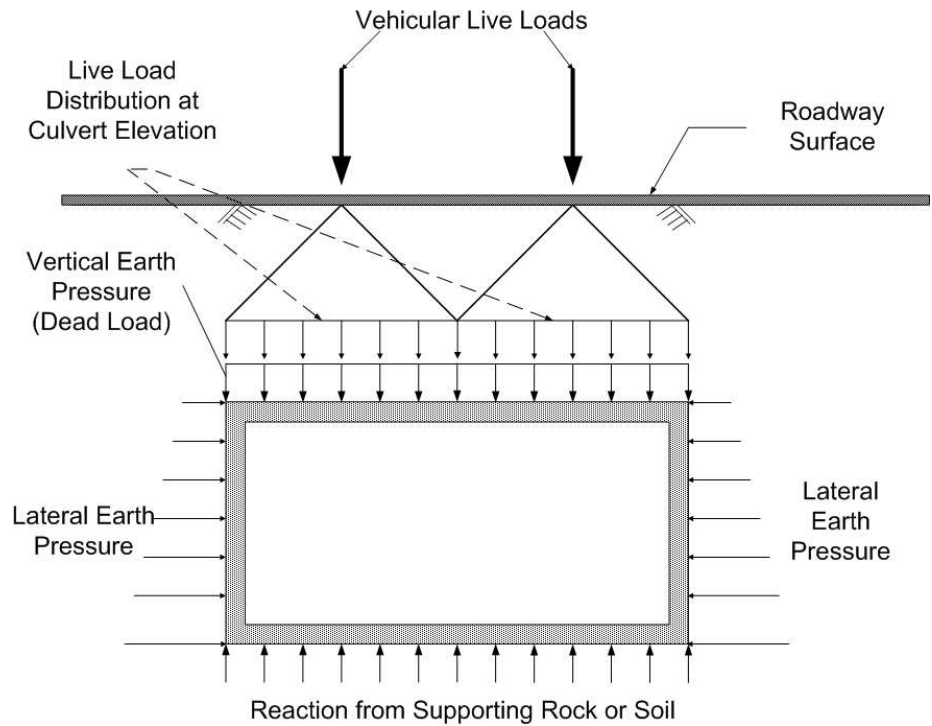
Loads on a Concrete and Timber Box Culvert
